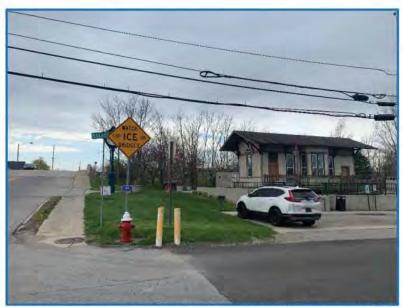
View of Depot Park facing south from the intersection of SR 22 and Railroad Street. The SR 22 bridge over CERA railroad is on the left.(04-22-20)
